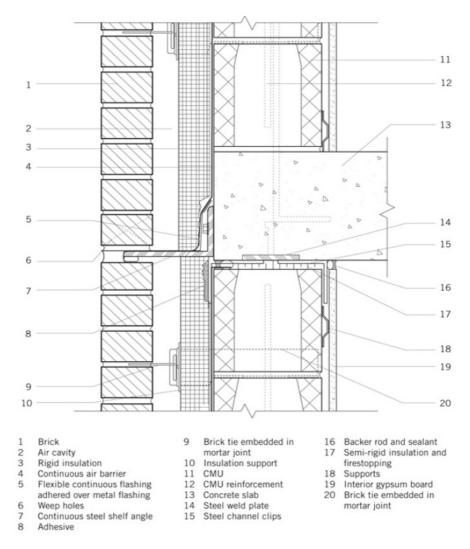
Masonry facade (Brick, hollow, frame, steel stud wall)
